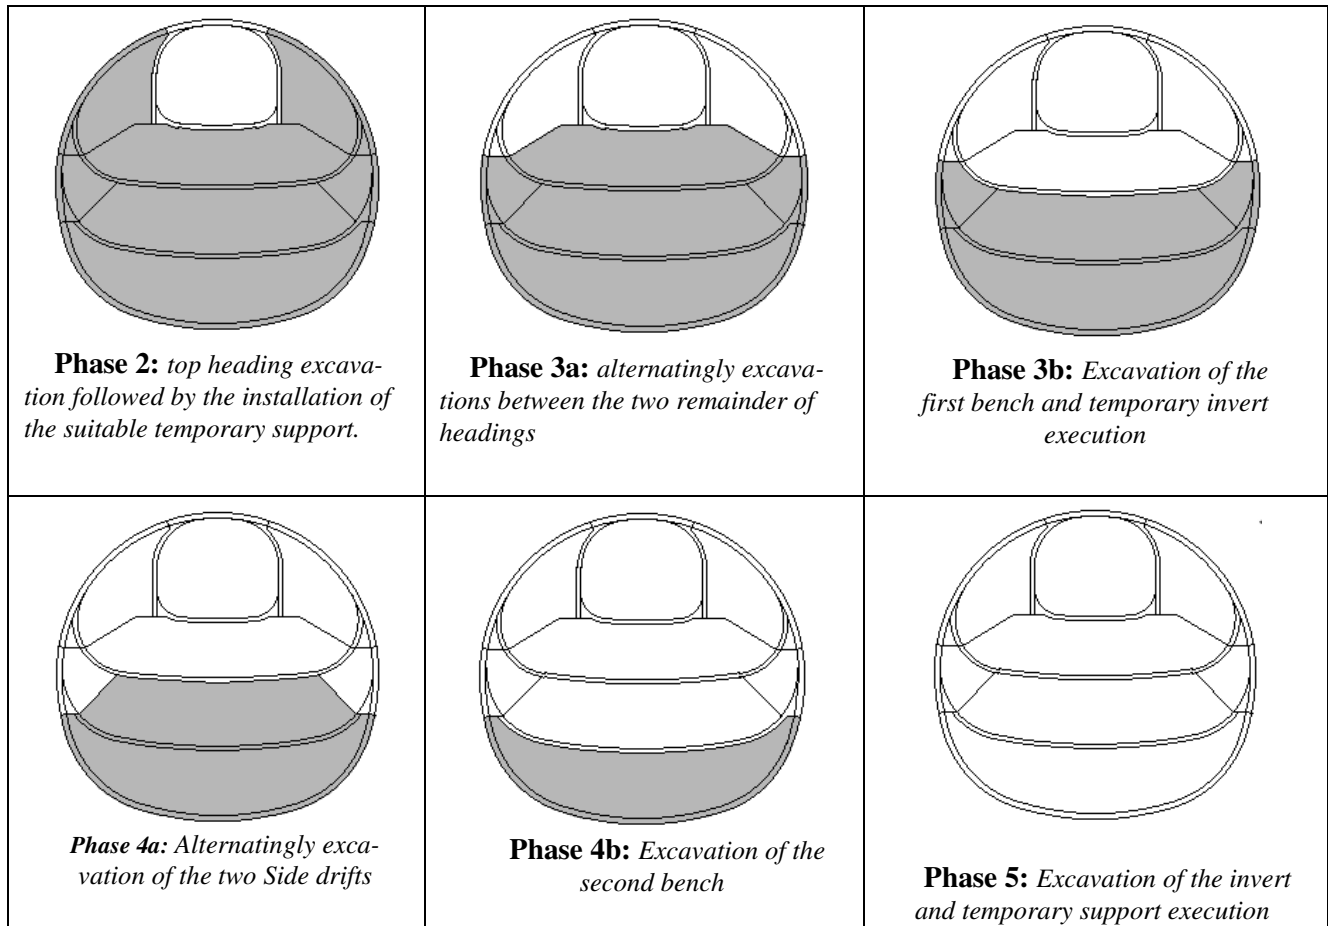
Typical scheme of excavation sequences of the underground gallery
